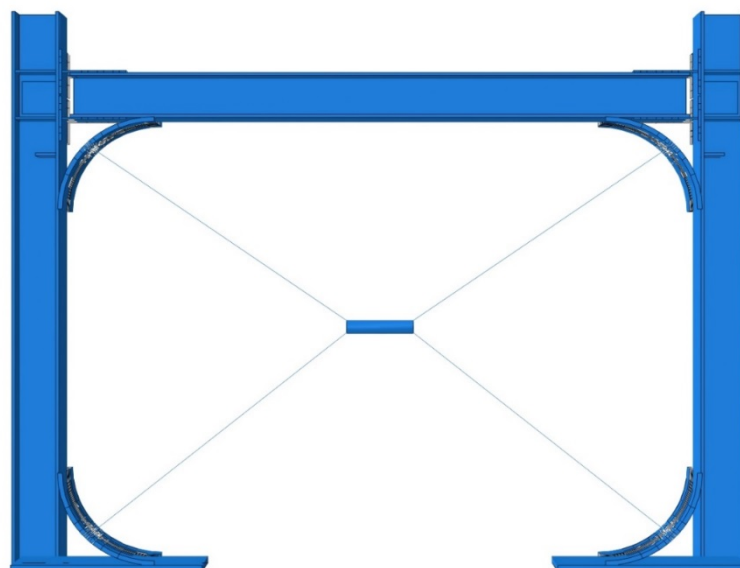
Portal moment frame subassembly endowed with a cable-cylinder bracing system after Hou and Tagawa [2].
